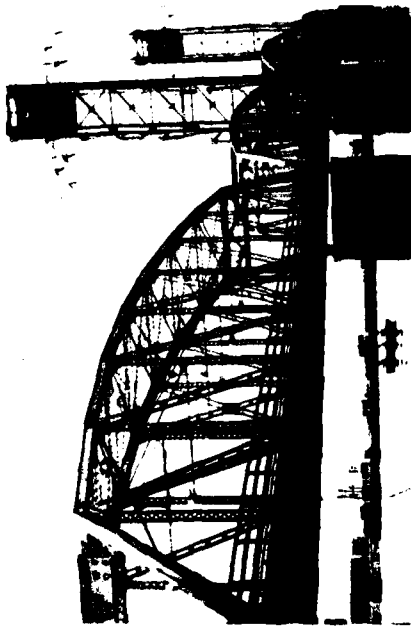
Cochrane Bridge over the Mobile River. Four span Parker through truss with Waddel vertical lift.
